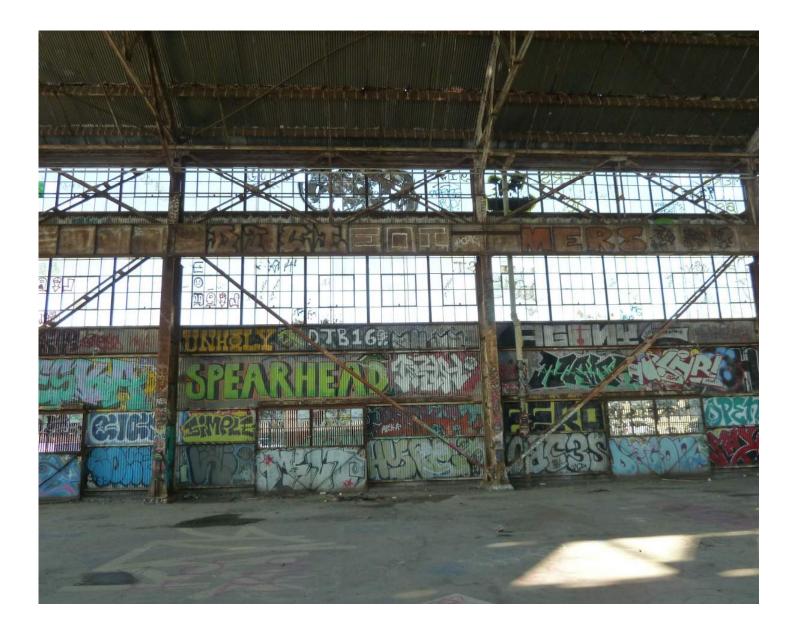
Single Diagonal Brace at Every Bay on West Face
